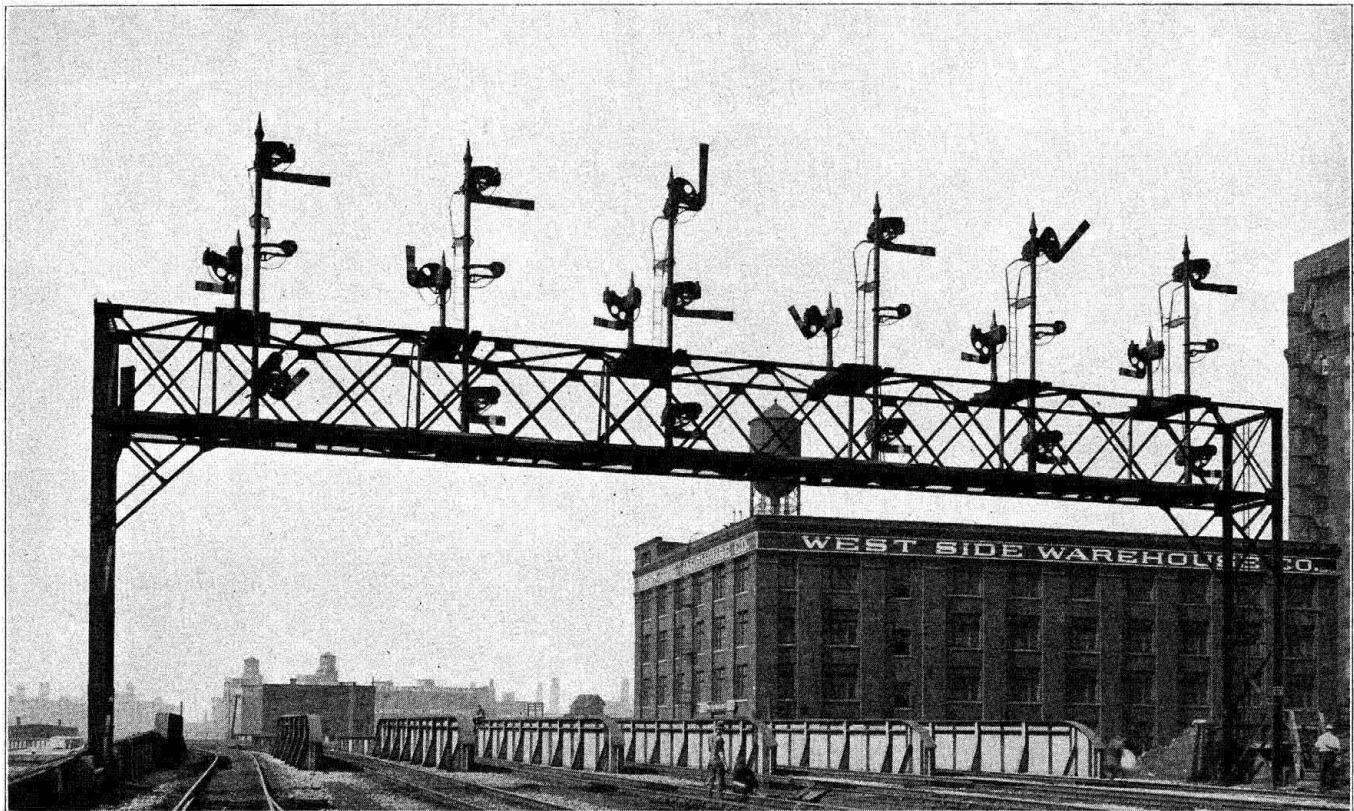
Bridge A, Between Lake Street and Clinton Street Towers. Signals on High Masts Are Controlled from Clinton Street Tower, and Signals on Low Masts from Lake Street Tower.
